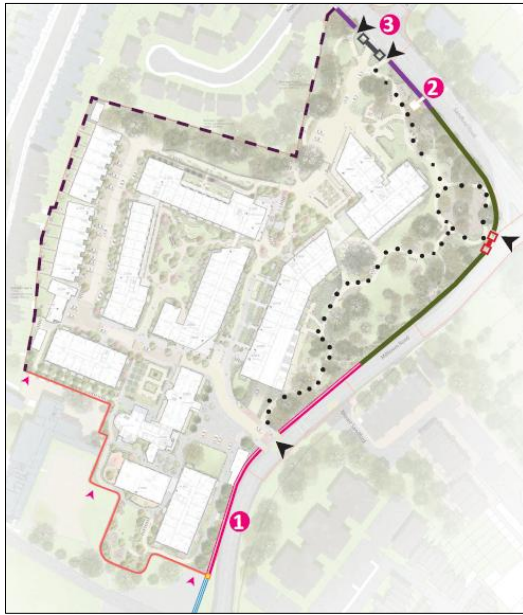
Boundary Treatment Strategy Fronting Sandford Road and Milltown Road Now Proposed
